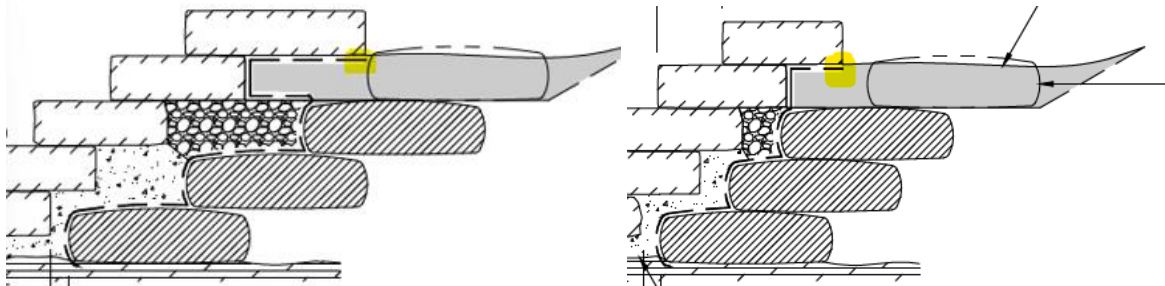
Geotextile ends in Type 1 and Type 2 structure sections
